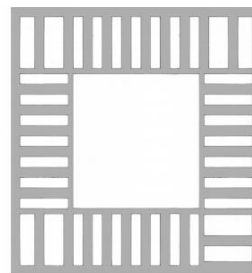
The plan of building no. 15 (Mohammadkhani, 2009).
